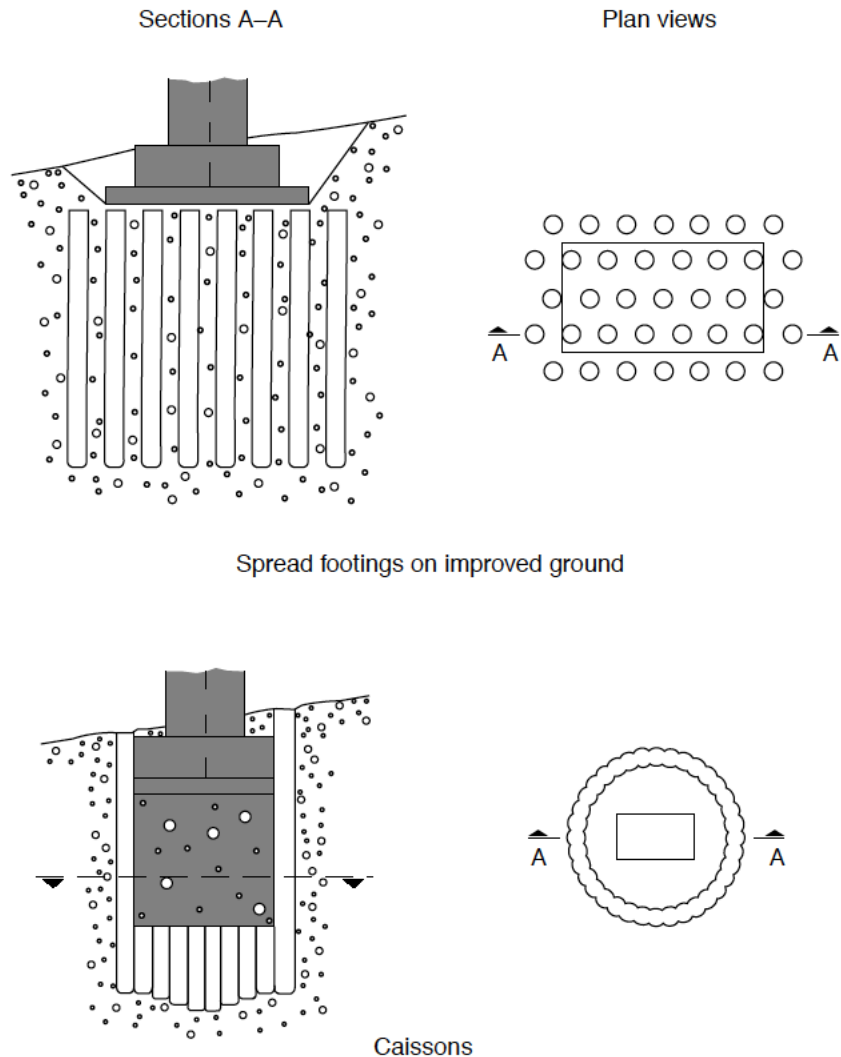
Typical designs for foundation work including grouting (Lunardi 1997).
